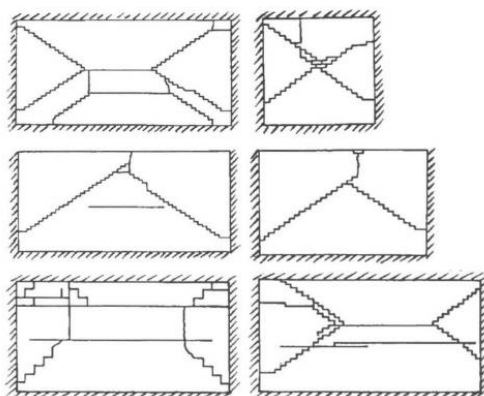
Examples of wall crack patterns (Lawrence & Marshall, 2000).
